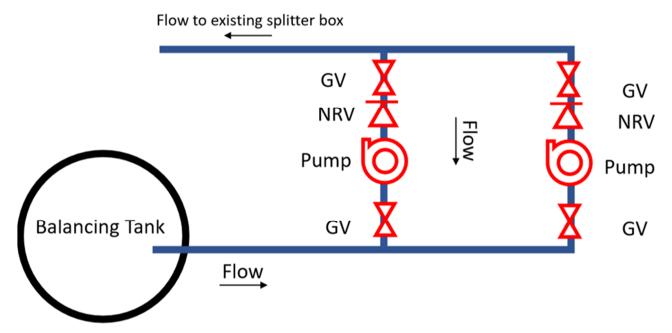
Mark Up of Balancing Tank Return Pump Layout
